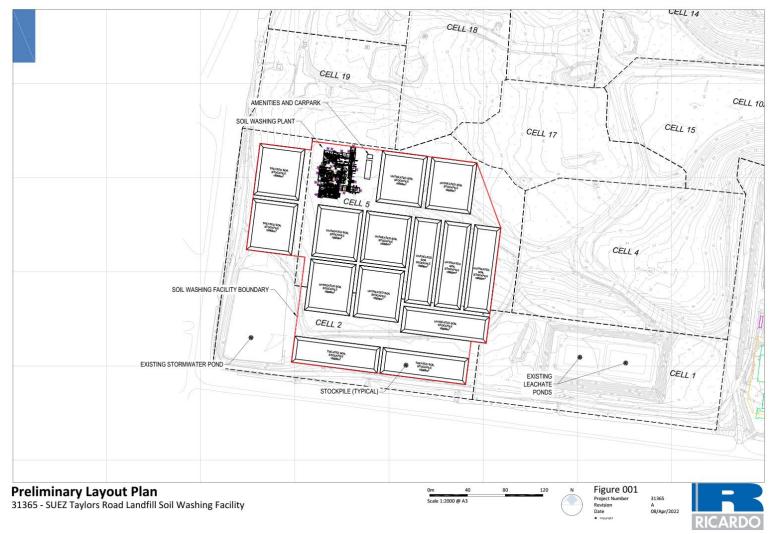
Preliminary layout plan of the proposal in the south west corner of the overall site
